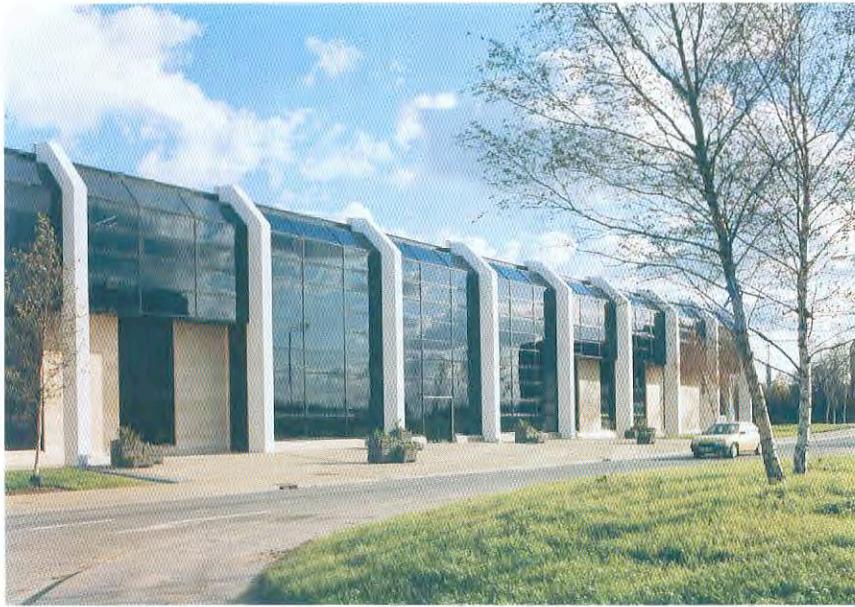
Architectural / structural precast columns in white concrete support steel roof lattices. (Courtesy of British Cement Association, UK)
